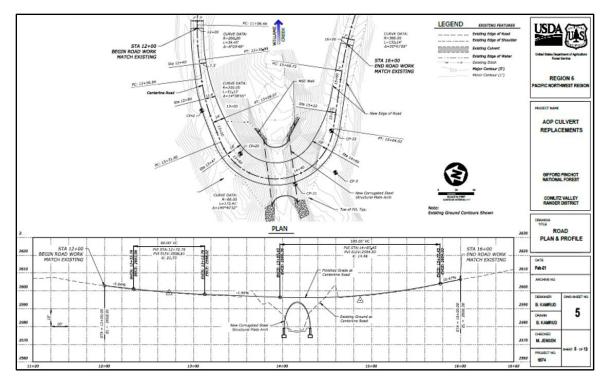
Road plan and profile of a typical open-bottomed arch structure with pre-cast concrete footings to provide AOP at all flows and life stages.
